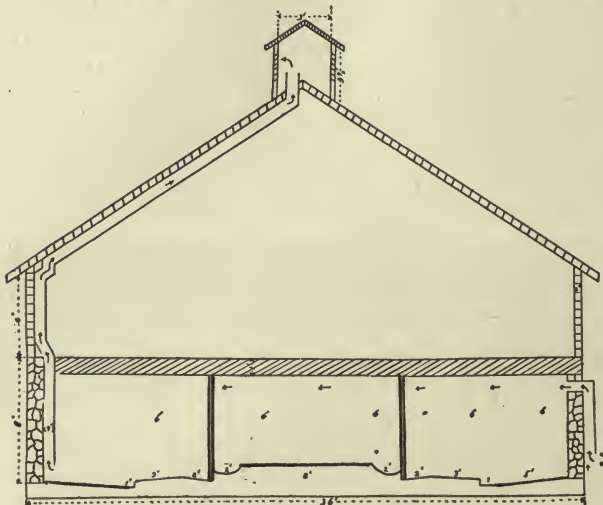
King system of ventilation for dairy barns. The air outlet should start near the floor and extend through the roof. The inlet for air into the stable is near the ceiling, but should start outside well above the ground. Windows are for light, not for ventilation, when the King system is in use.
